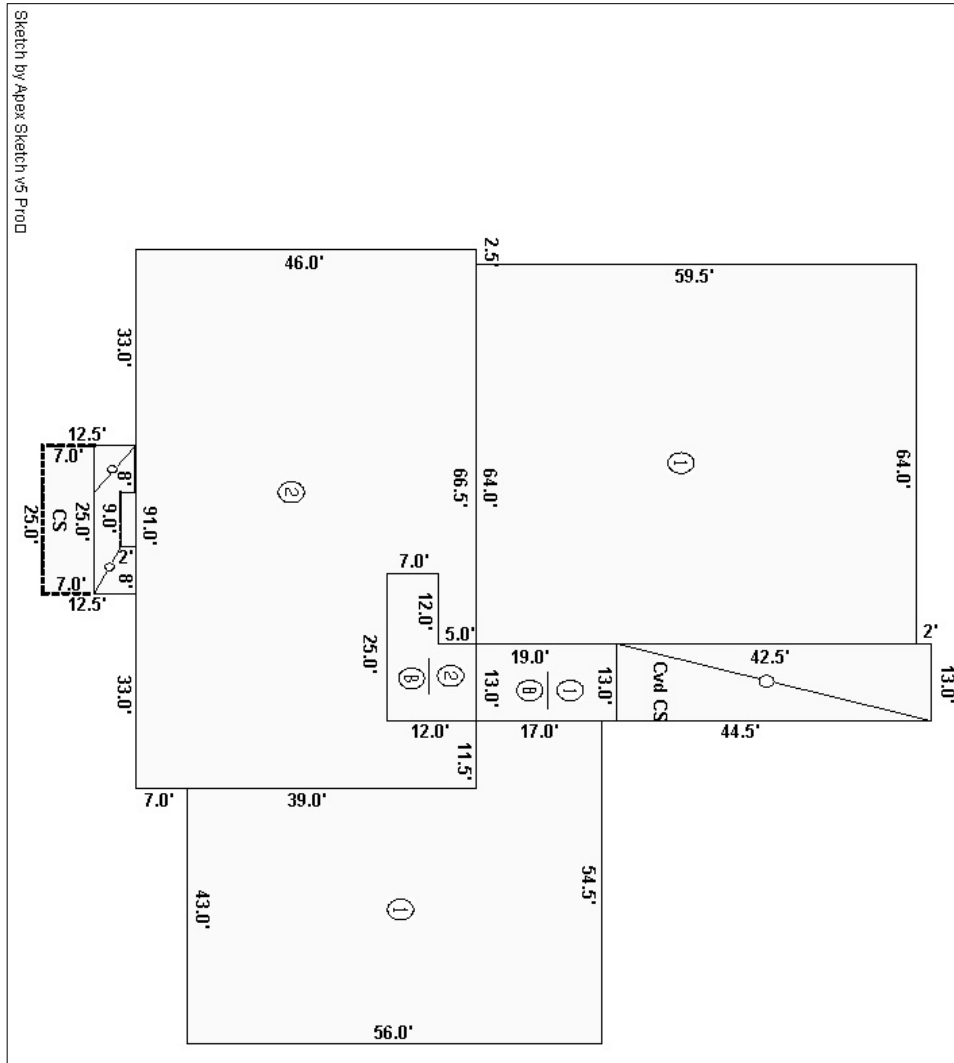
Plan view sketch map from the County Assessor's Office of the first floor of the studied building, with north oriented towards the top of the page.
